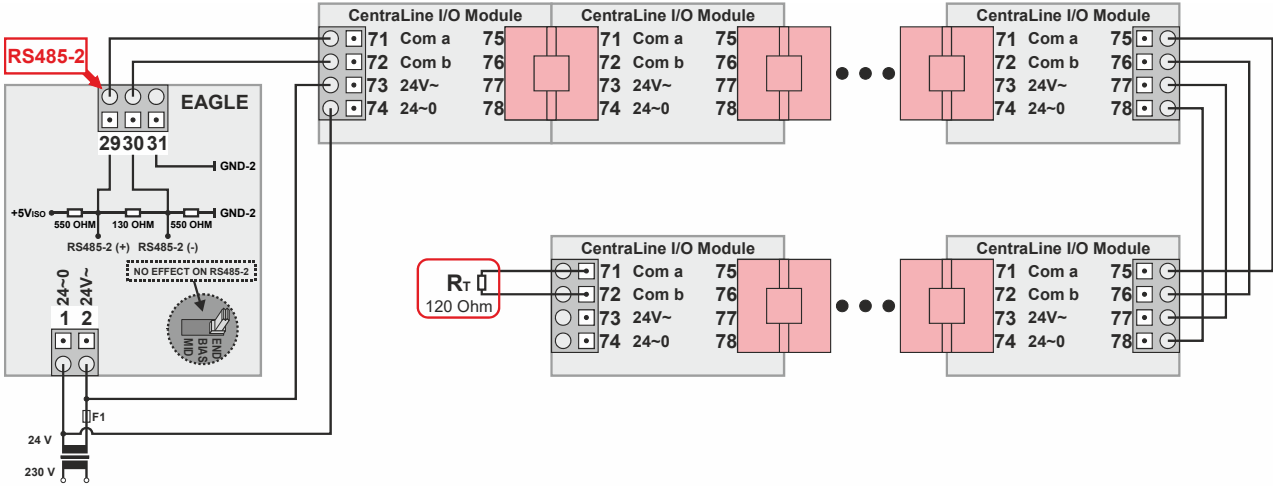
Connecting RS485-2 of the EAGLE with Panel Bus I/O Modules (single transformer)
